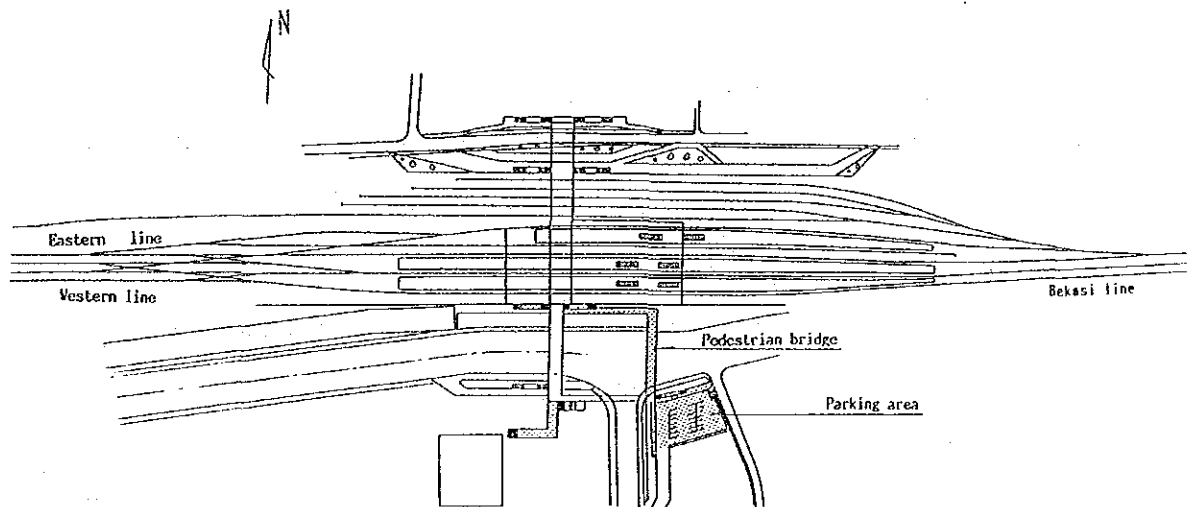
Jatinegara Development Plan (Second Stage)
